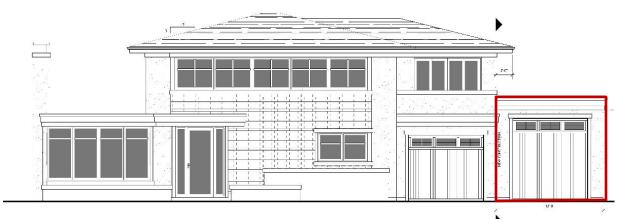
Elevation of existing dwelling with proposed garage addition outlined in red.
